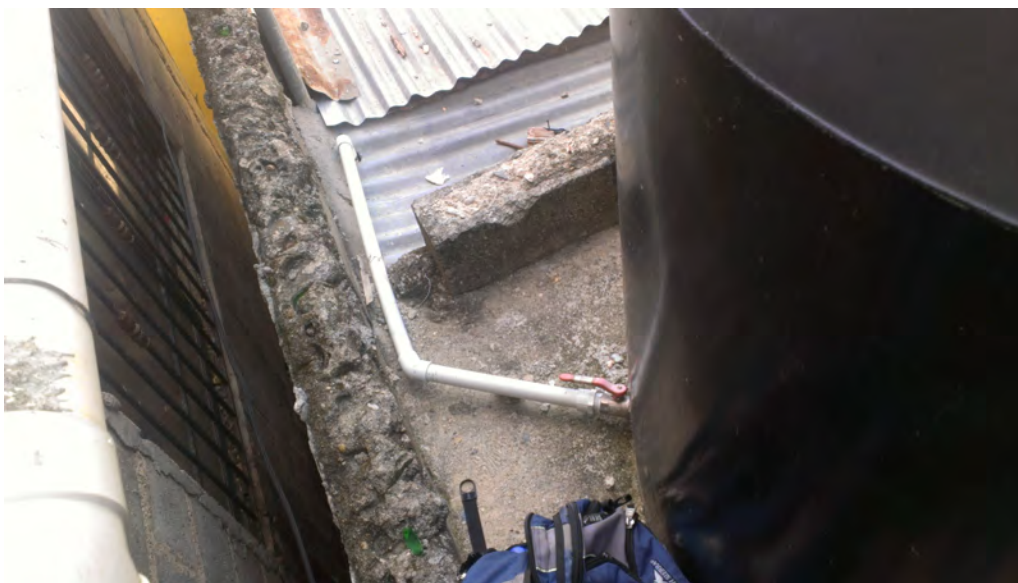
Water was piped from storage through a hole in a sheet of galvanized roofing to the floor below using 1.5 inch diameter PVC.
